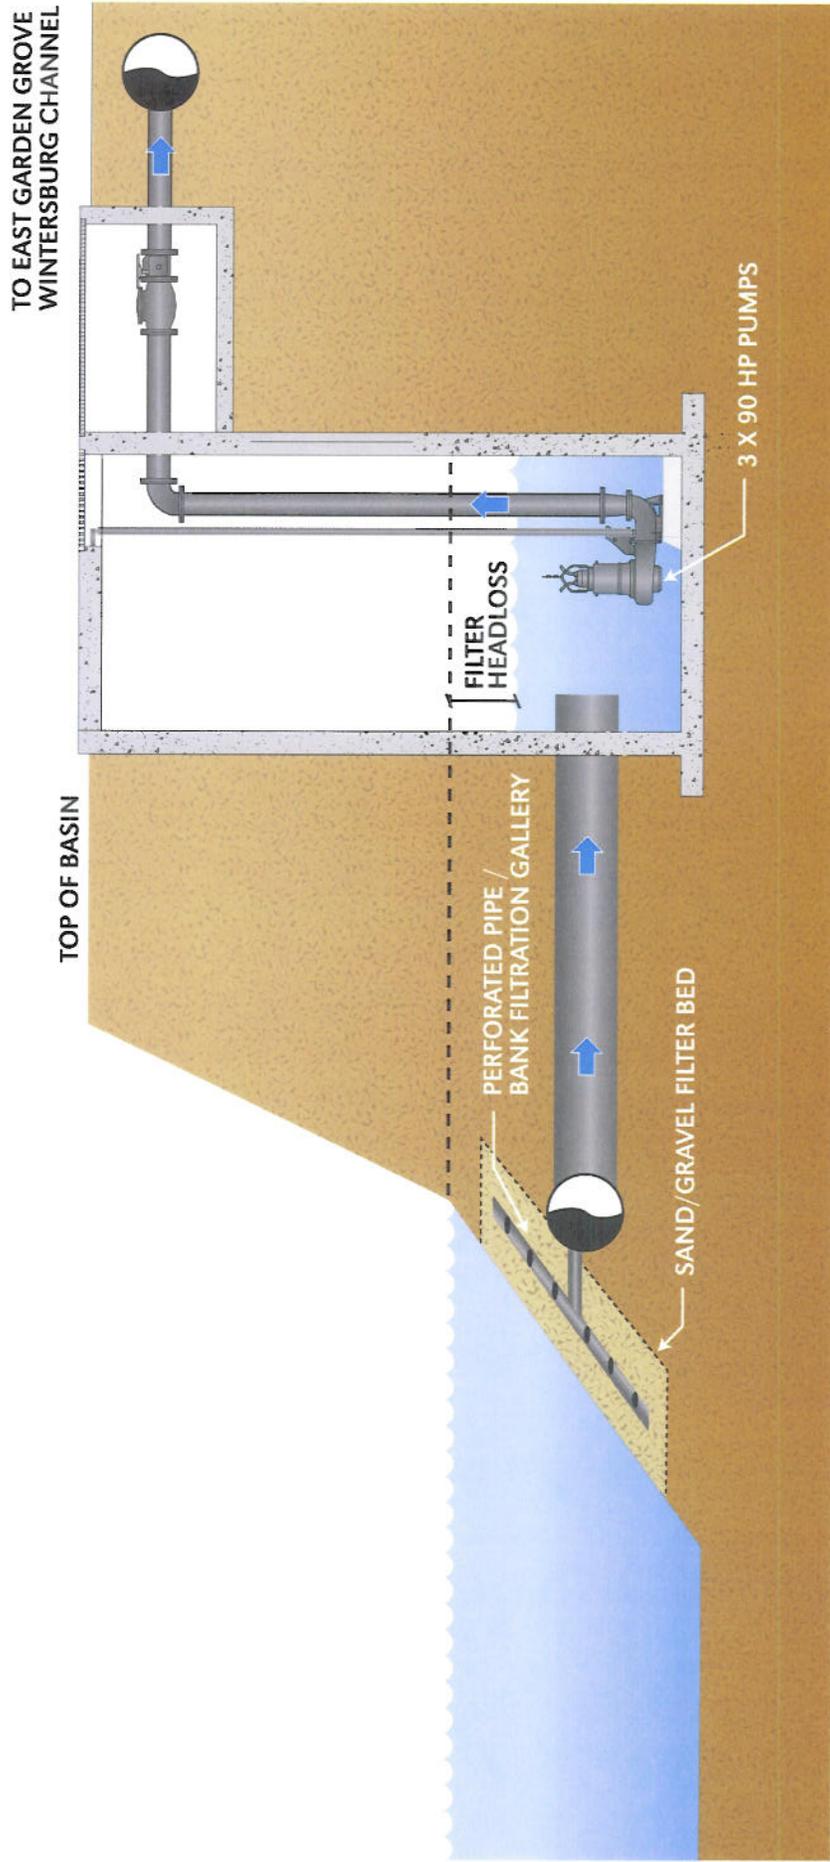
Conceptual Cross Section for Bank Infiltration System
